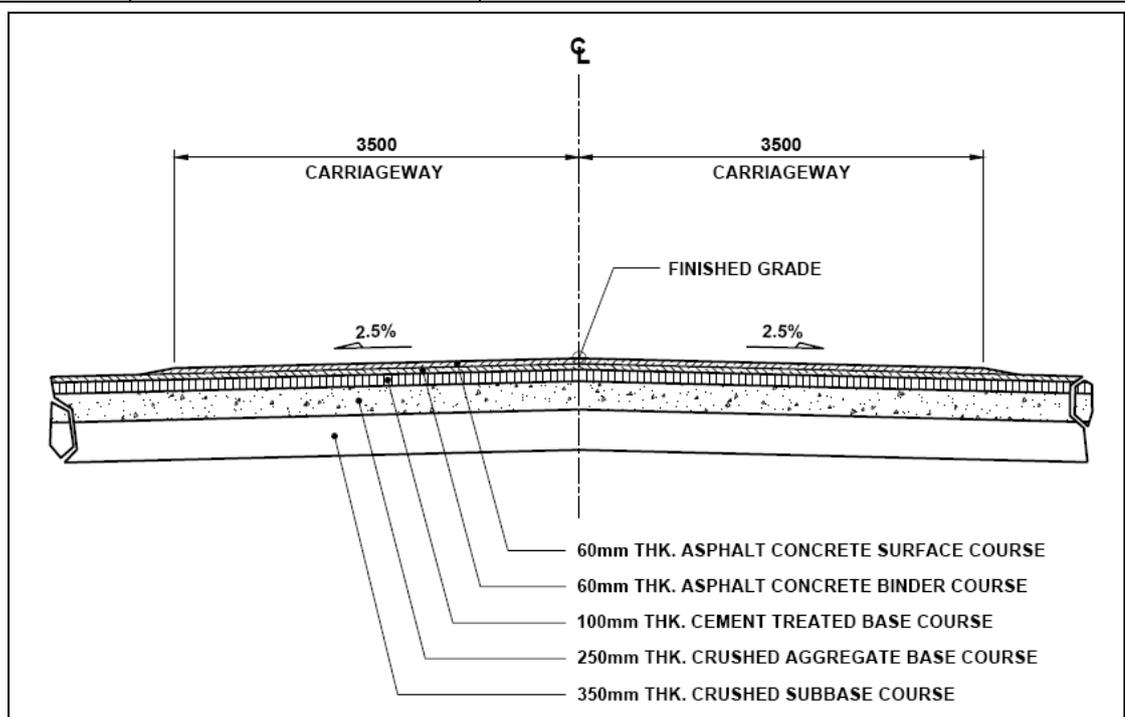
PAVEMENT STRUCTURE OF MAIN CARRIAGEWAY
